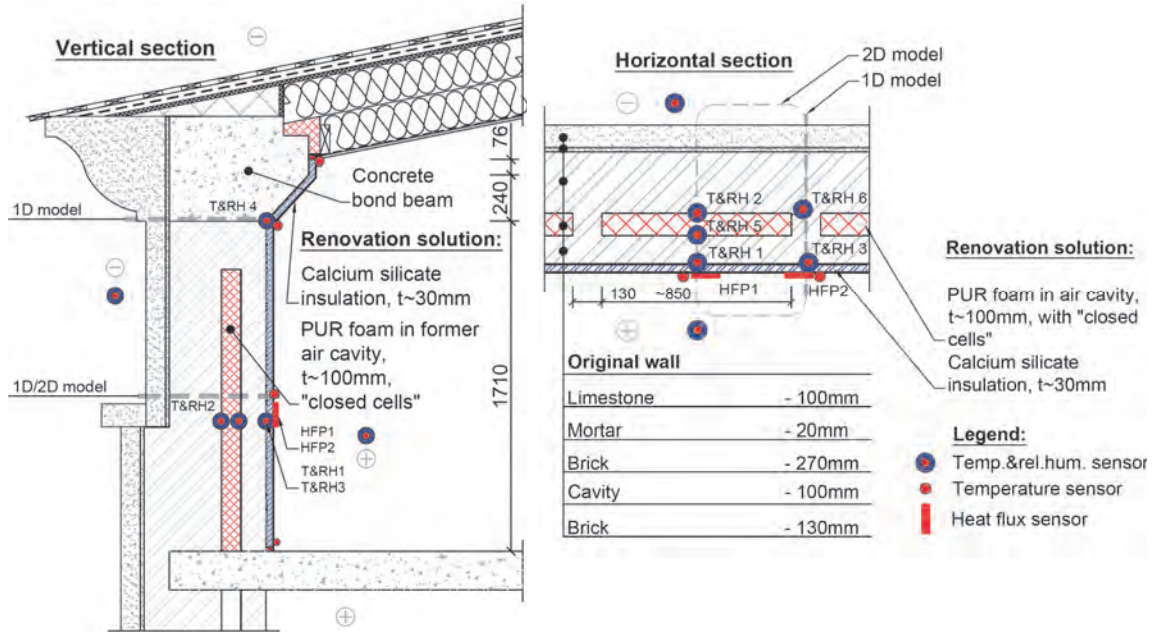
Vertical and horizontal sections of the wall showing sensor placement and wall layers.
